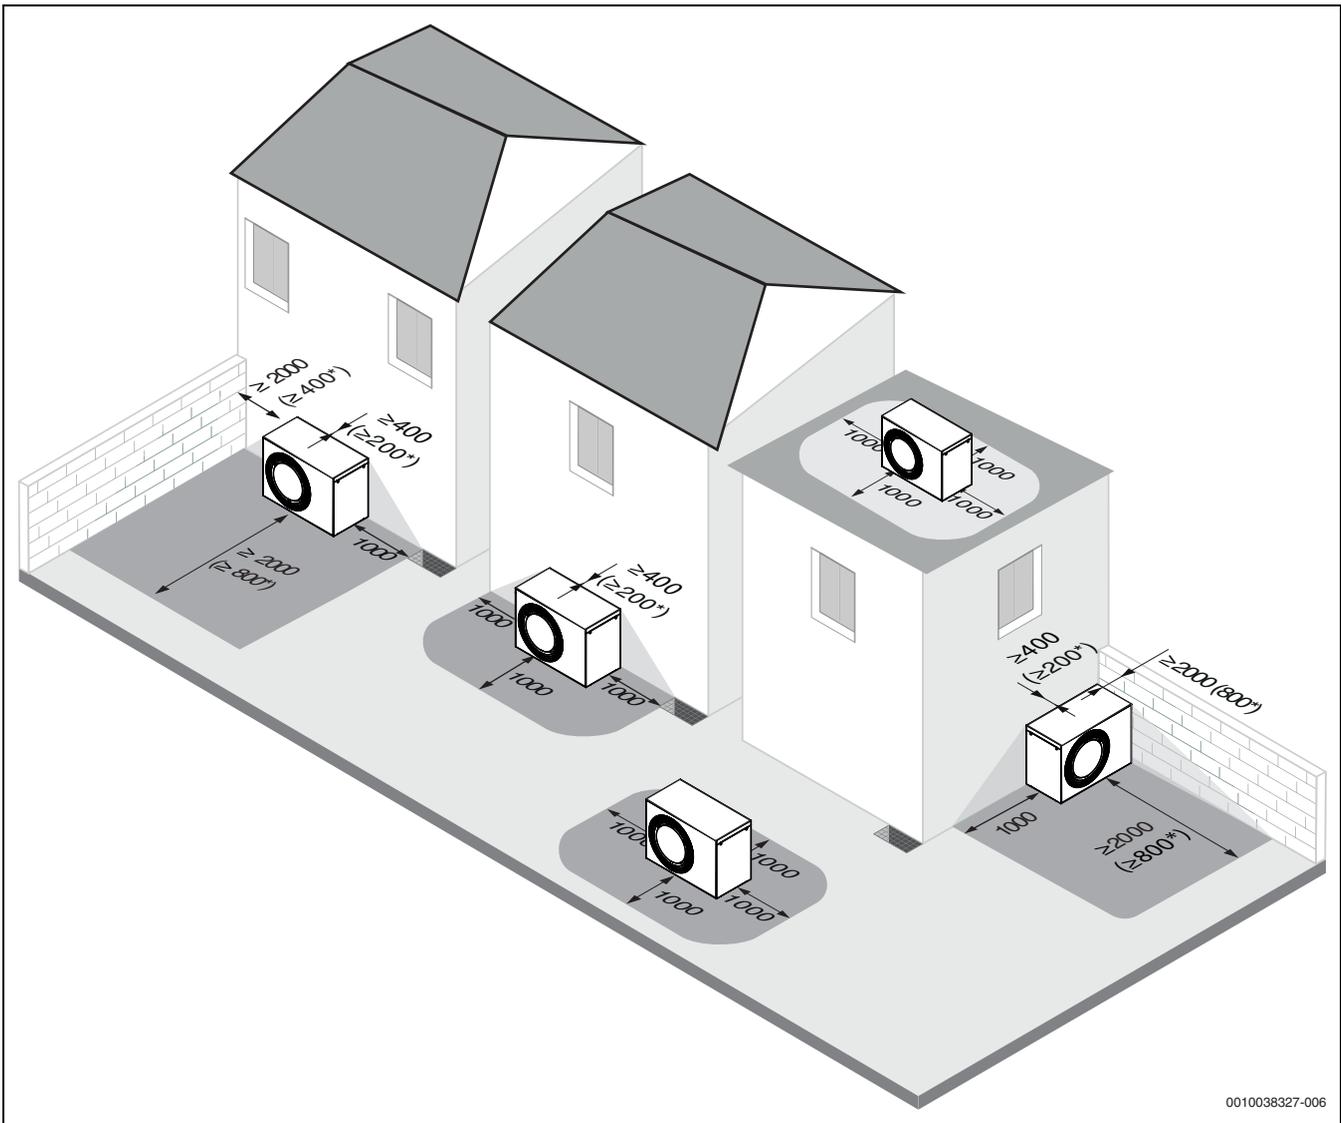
Recommended space between the heat pump and surrounding solid objects (mm)
